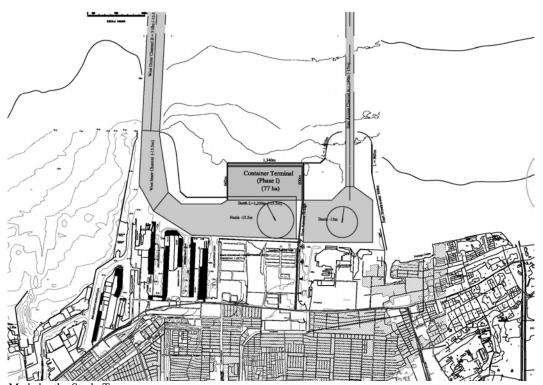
Facility Layout Plan of North Kalibaru Expansion in Phase I (Alternative-2)
